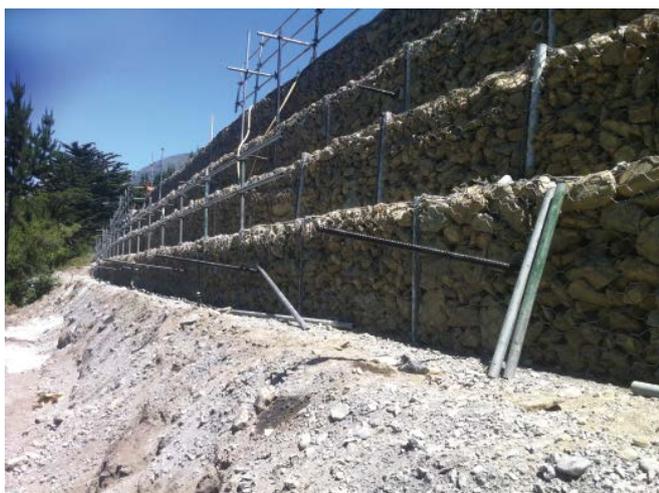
shows the Sand Pit retaining wall during November 2017 when construction of this structure was approximately 80% complete.
